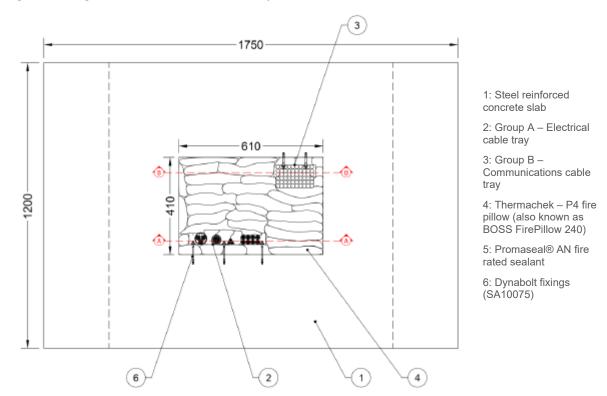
Plan view of tested system in EWFA 39693400.1 with Thermacheck fire pillow (also known asBOSS FirePillow 240) arranged longitudinally protecting Group A and Group B cable penetrations
